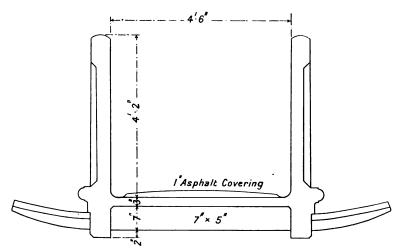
Footbridge at Bollo Lane. Cross Section of Superstructure.
